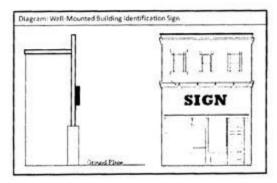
A. Wall-Mounted Building Identification Sign.
